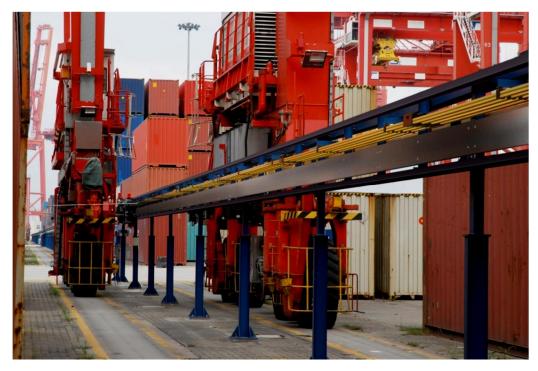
Typical Details of Electric Buss Bar Arrangement for E-RTG
